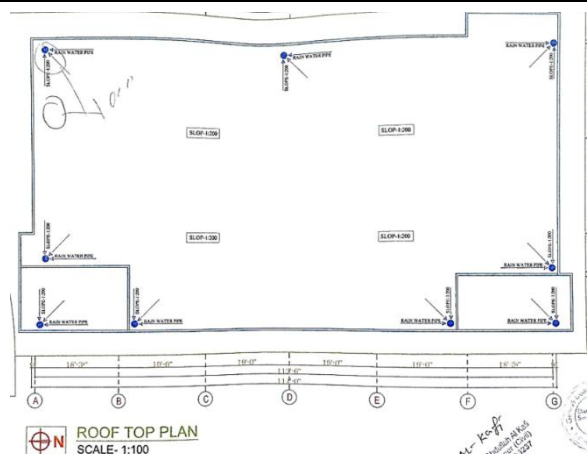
FACTORY BUILDING: 3 STORIED FACTORY BUILDING
